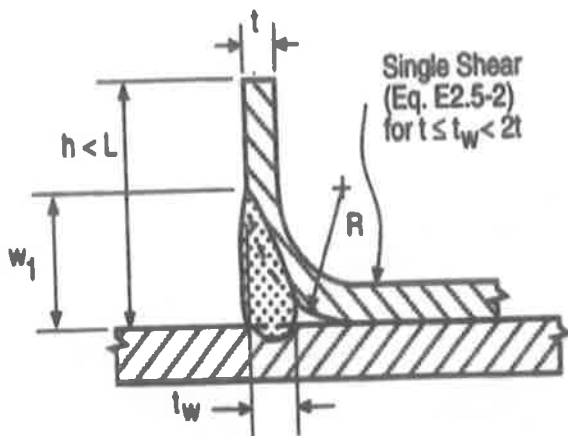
Flare Bevel Groove Weld (Filled flush to surface, $w_1 = R$)
